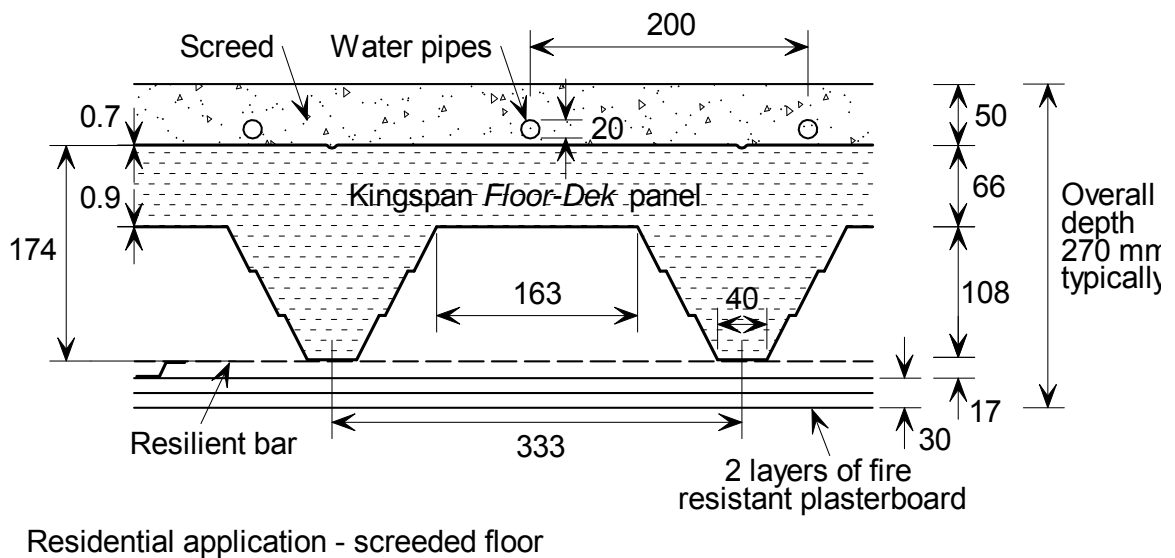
Use of *Floor-Dek* with a screeded floor and embedded water pipes for heating and cooling
